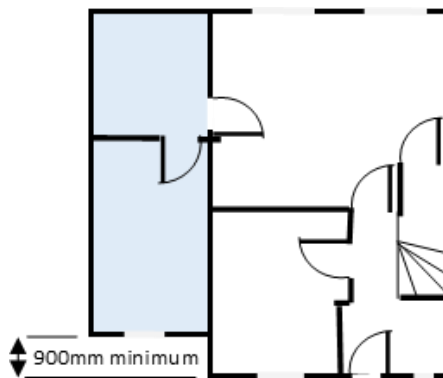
Side extensions should be set back at least 900mm from the front main wall of the house to ensure subservience.
